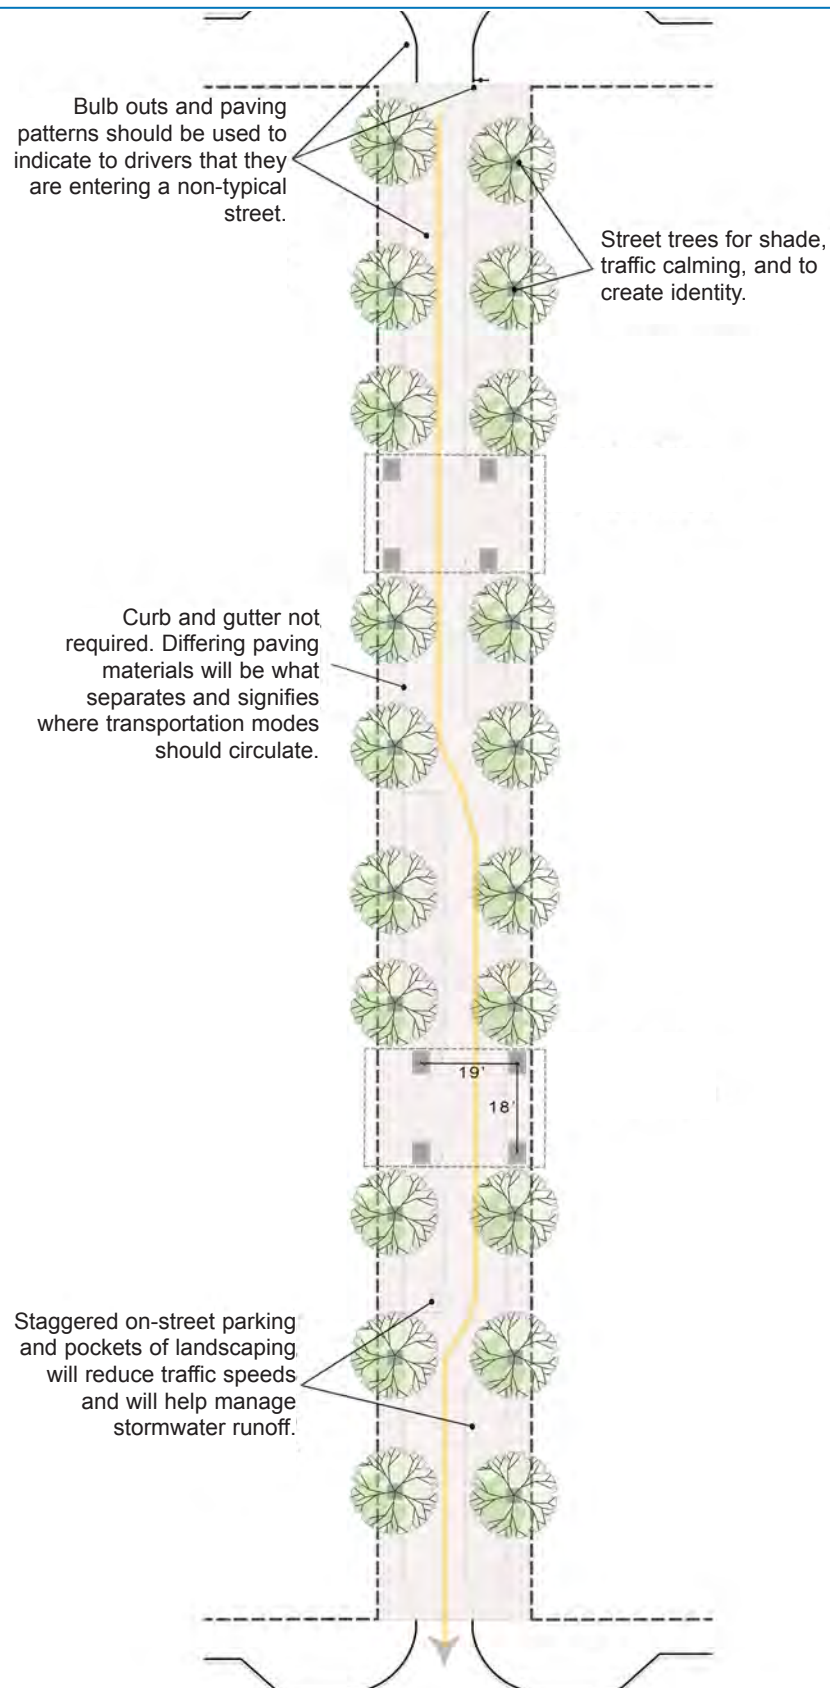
(2). Shared Space Street Plan View (illustrative)
